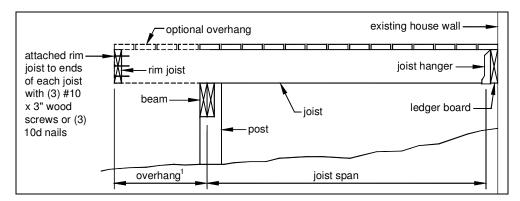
JOIST SPAN WITH OVERHANG - DECK ATTACHED AT HOUSE
